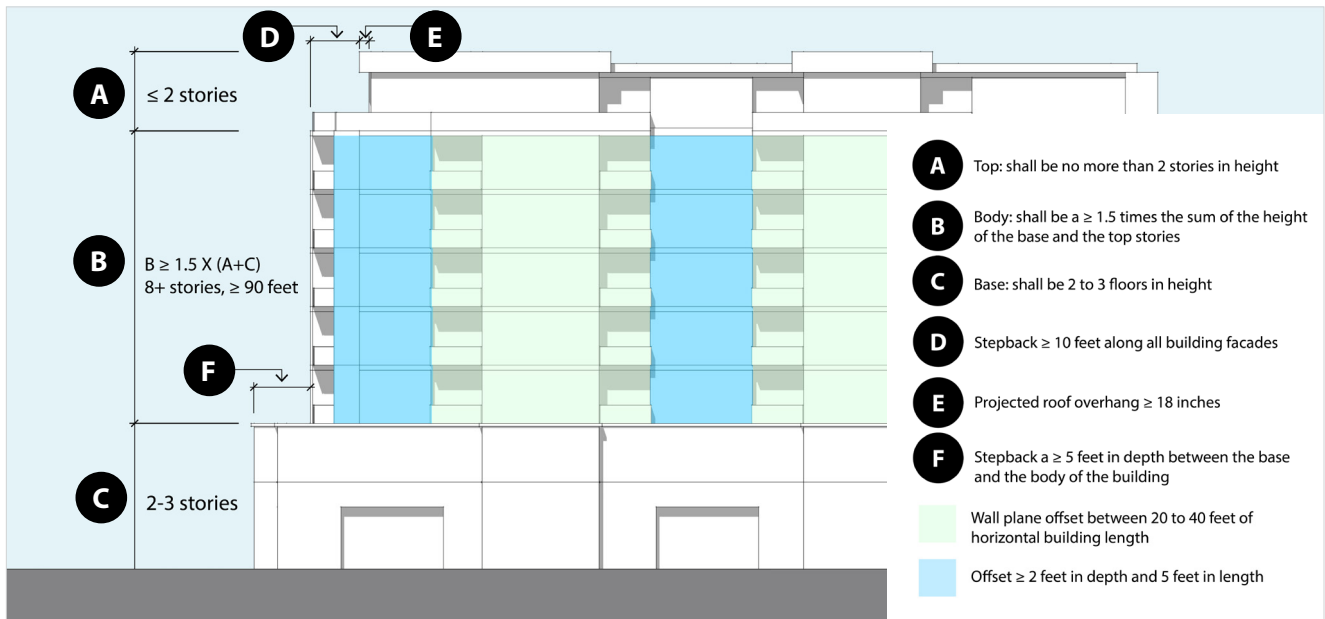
High-rise building wall plane horizontal offset examples (Section 4.1.7)
